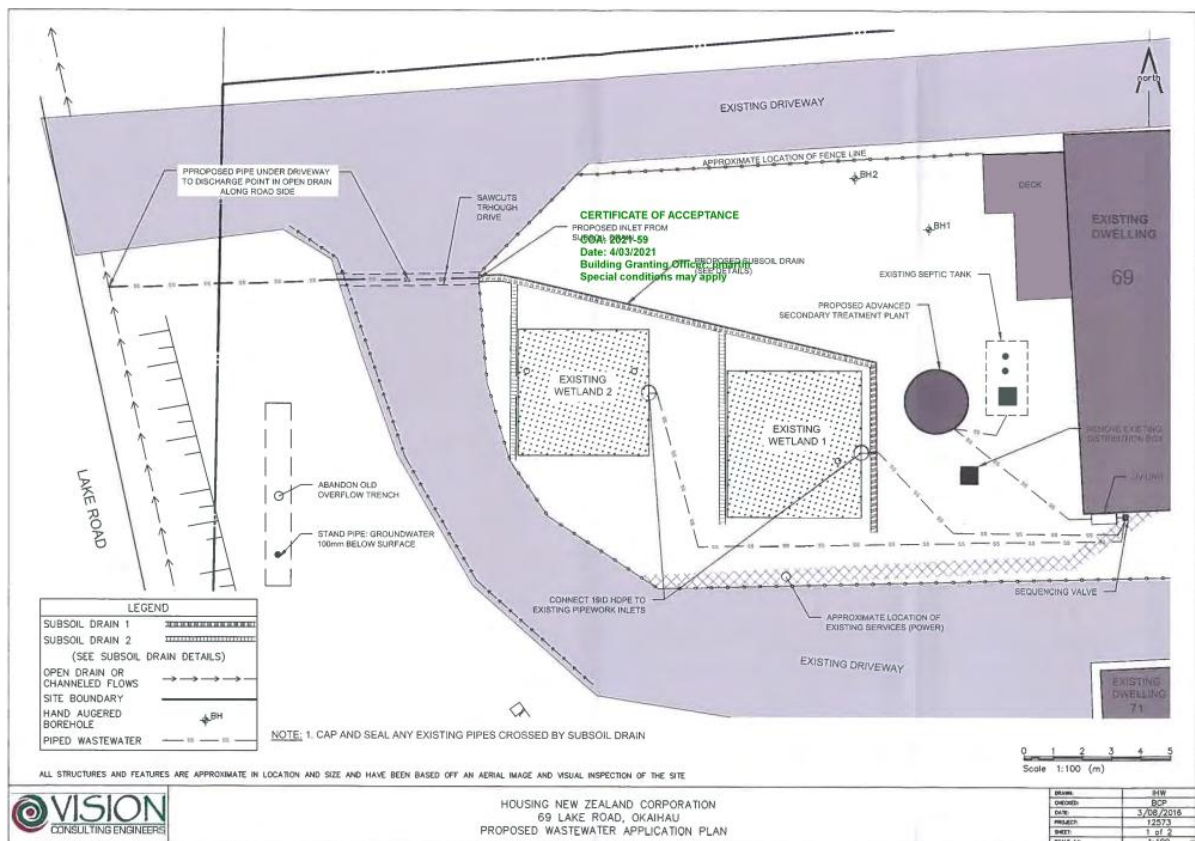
Approved Wastewater Design Plan for 69 Lake Road, Okaihau
